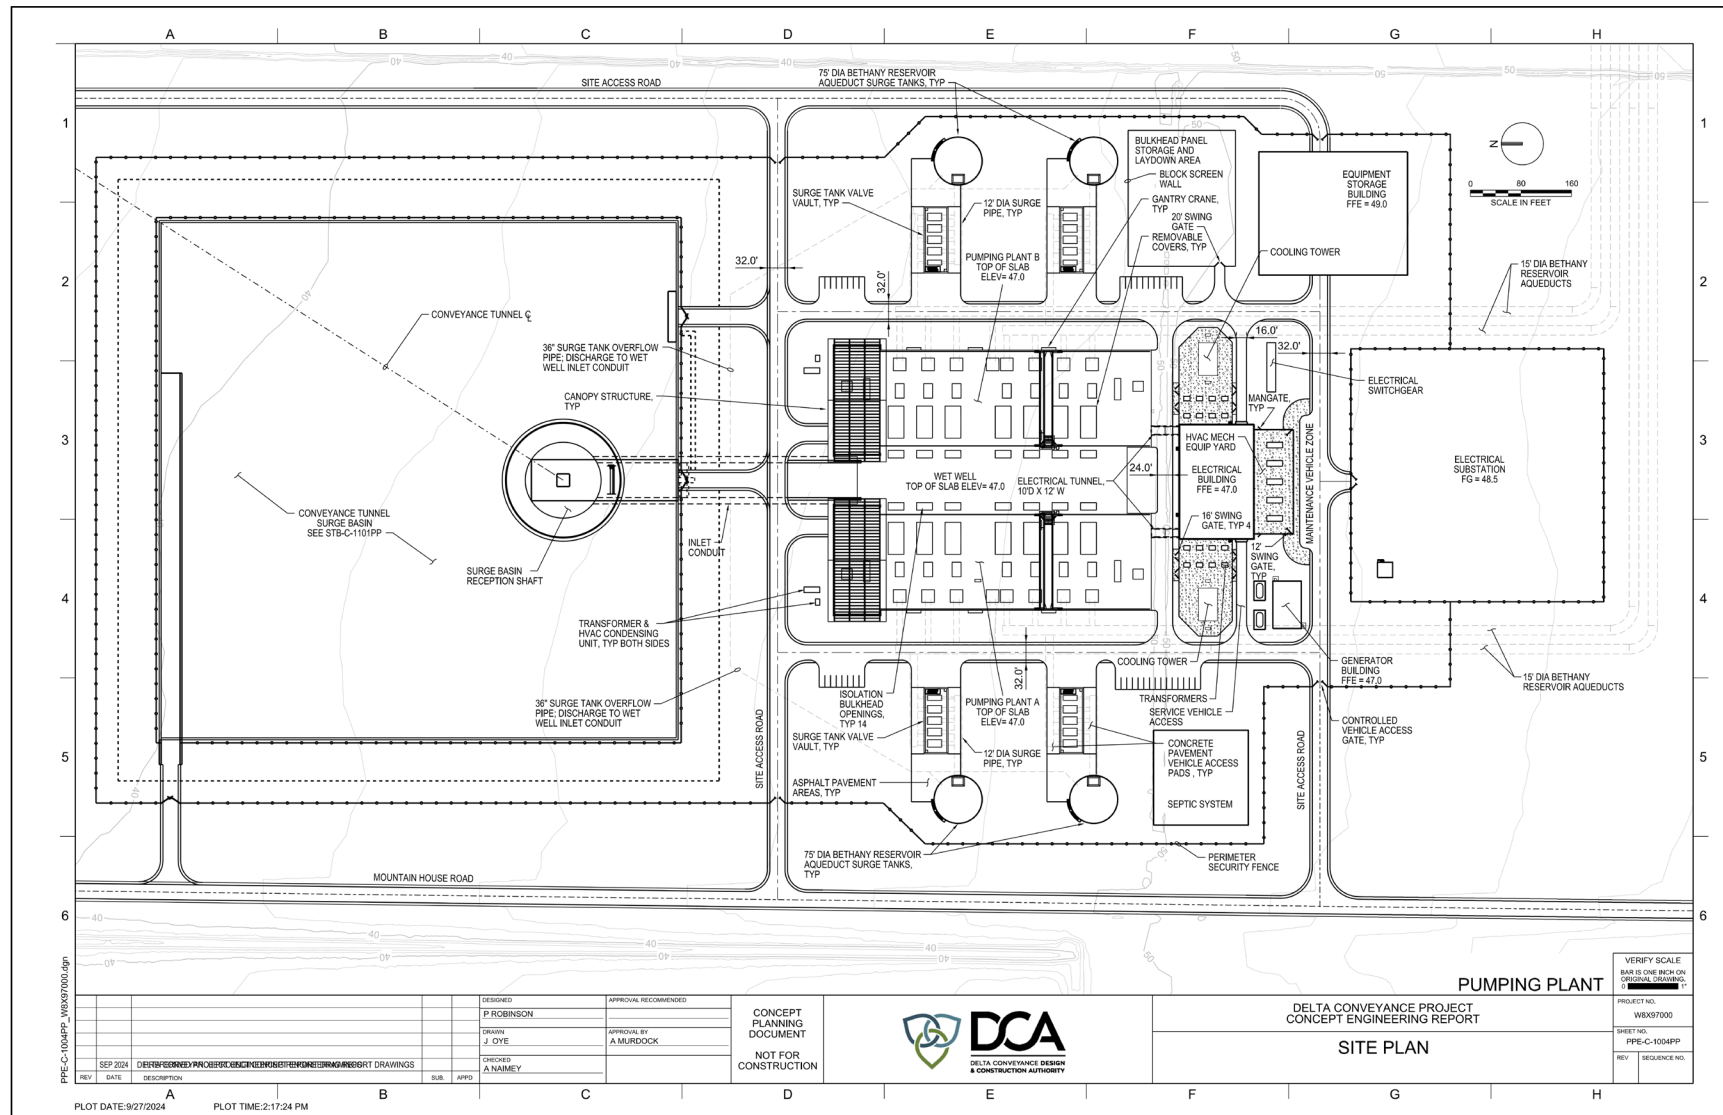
Bethany Reservoir Pumping Plant Facilities: Post-Construction Site Plan
